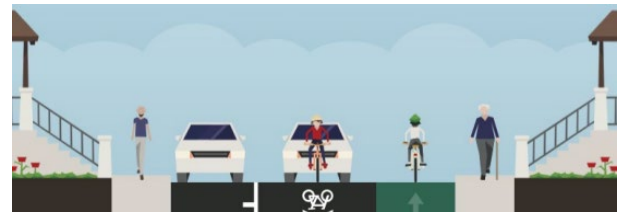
Illustration showing the proposed changes on Millicent Street between Emerson Avenue and Dufferin Street, facing west.
